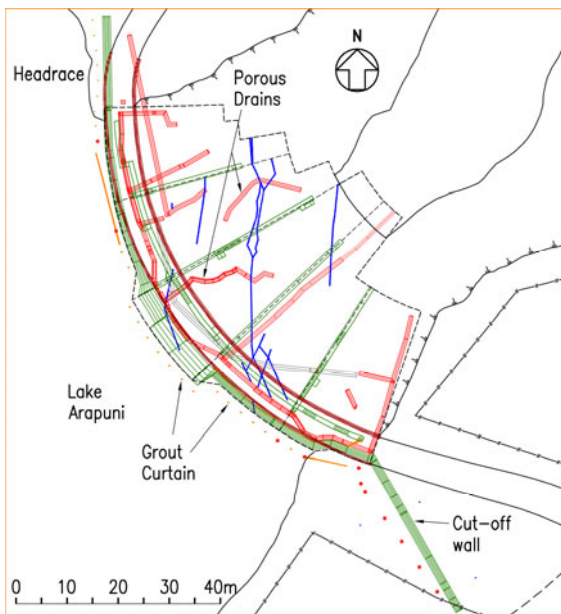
Plan view of Arapuni Dam (The positions of the foundation fractures noted during construction are shown. The diversion tunnel is south of the right abutment cut off wall)
